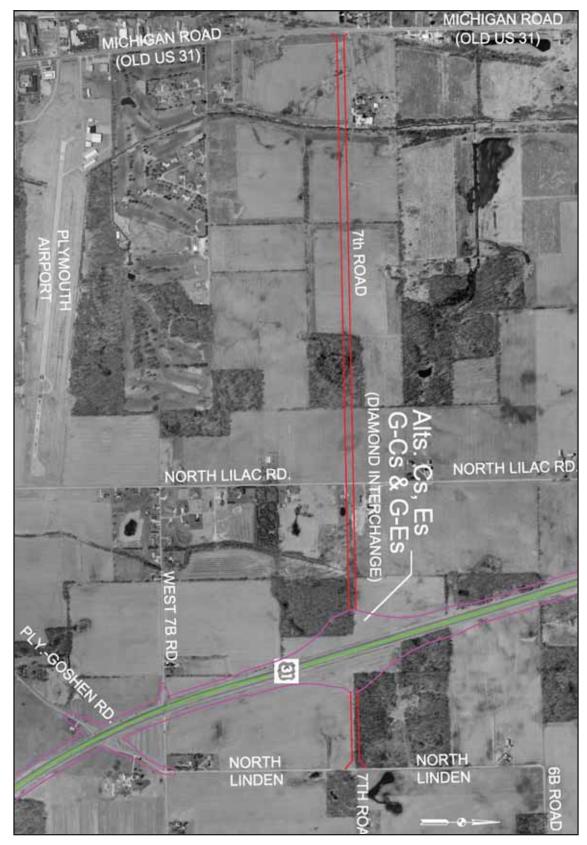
7th Road Extension Local Roadway Improvement Project
